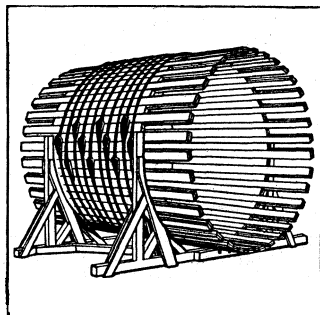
VIEW OF SPECIMEN LENGTH OF WOOD STAVE PIPE, SHOWING ELEMENTS OF CONSTRUCTION
